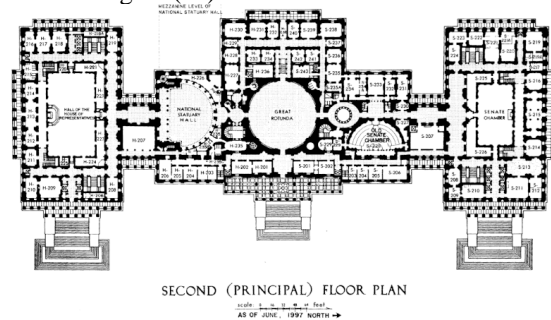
The Capitol building’s second-floor plan [51] The dome structure is currently the world’s largest cast iron dome. The dome structure comprises three distinct components [52]. The outer dome is marble with hollow brick backup and embedded steel tension bands. The middle dome is a conical steel structure supporting the dome’s steel-framed Lantern, which consists of steel column ribs connected to the tension ring at the base of the outer dome. The inner dome forms the rotunda ceiling, as shown in Figure (38). The dome is raised on a high drum in two parts: a lower portion encircled by a colonnade on the outside, an interior surface pierced by windows, and an upper part. A Lantern crowned with decorative statuary
